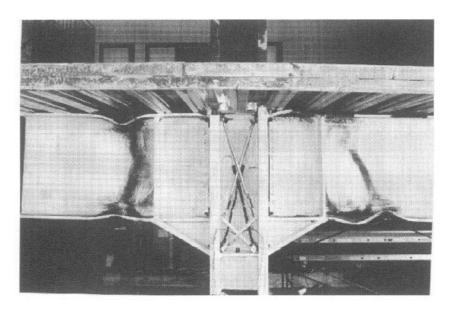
NIST/AISC Welded Haunch Test
